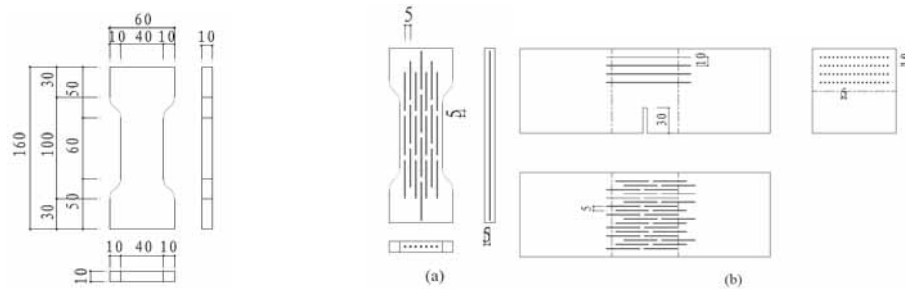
Specimen geometry in tensile test Figure 2: Orientated arrangement of steel fibres
